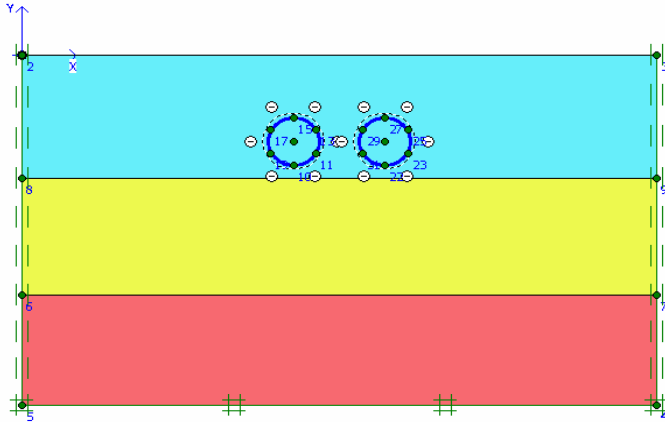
Cross section of the Ben Thanh - Suoi Tien Tunnel
